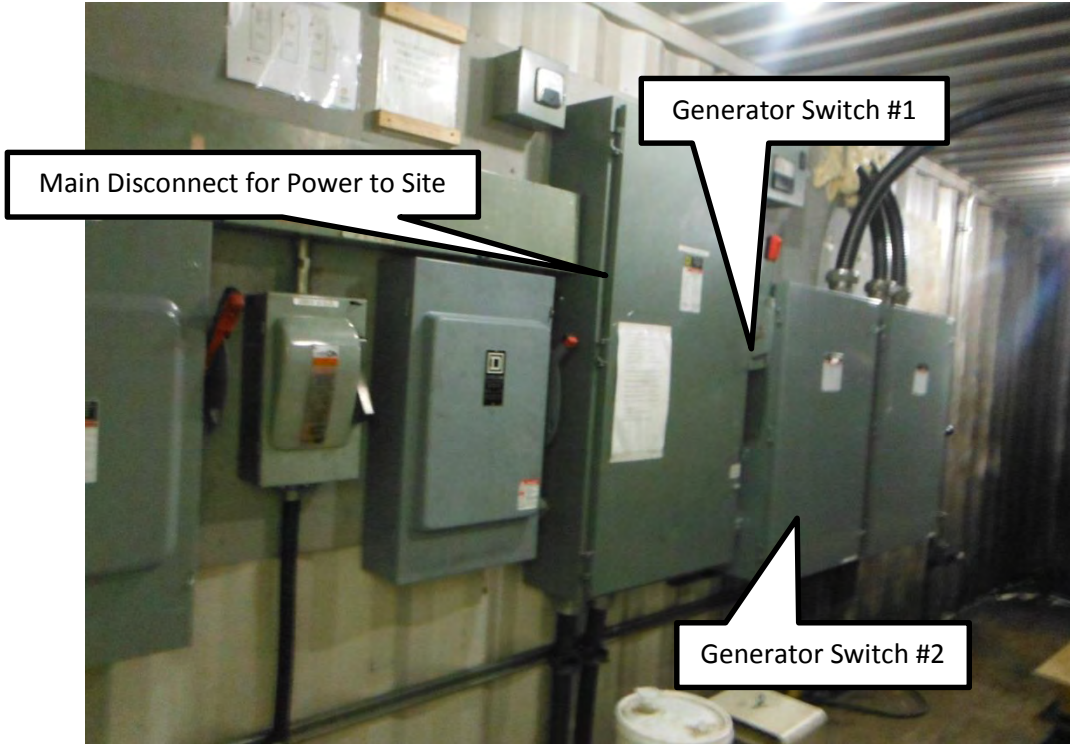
Generator Switch Gear in Perkins Generator sea-Can
